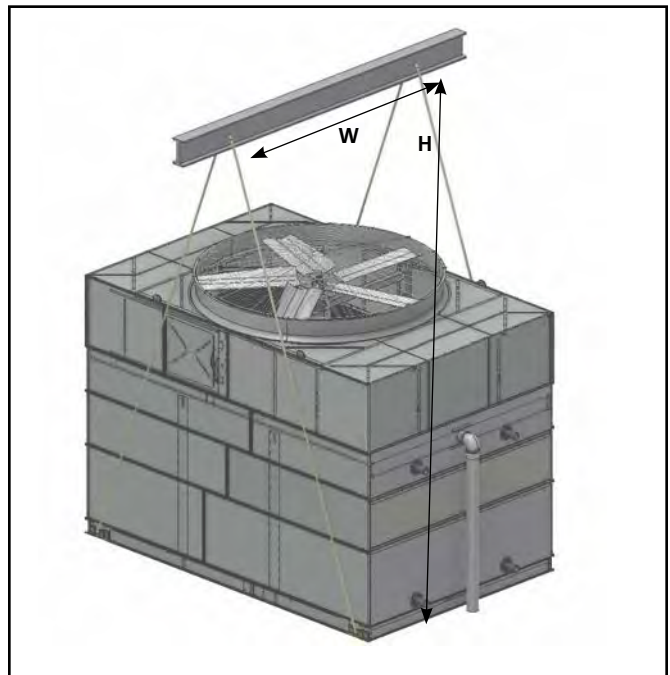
Upper Section Two-Piece Lift (Casing and Mechanical)
